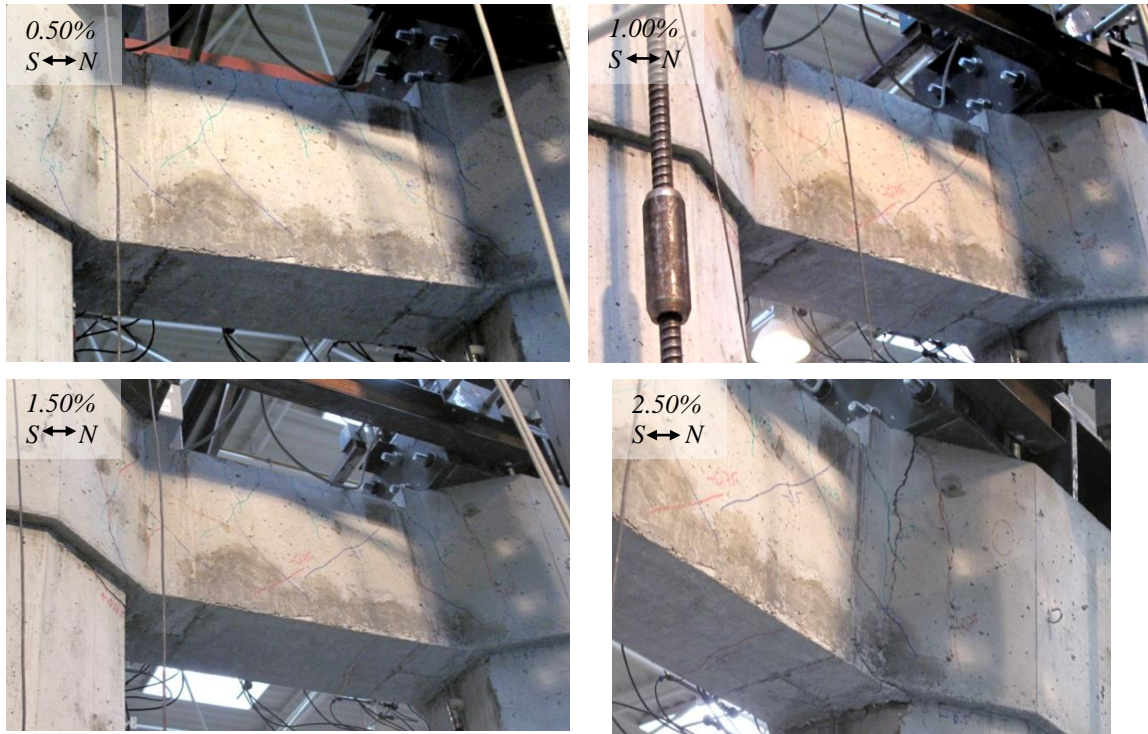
SP_M02C Beam cracking pattern
